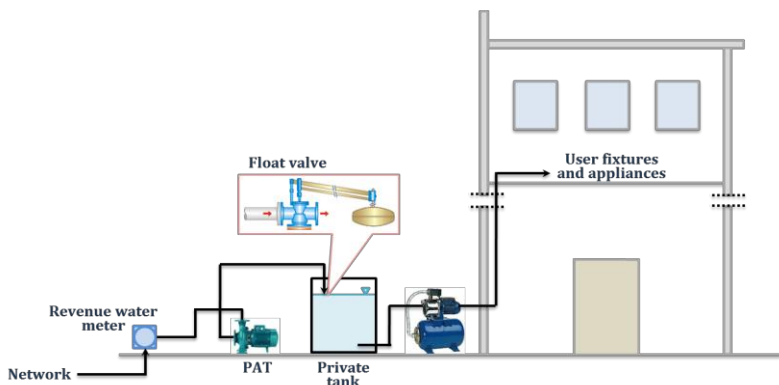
A schematic of the modelled system considering the PAT installation with an underground tank
